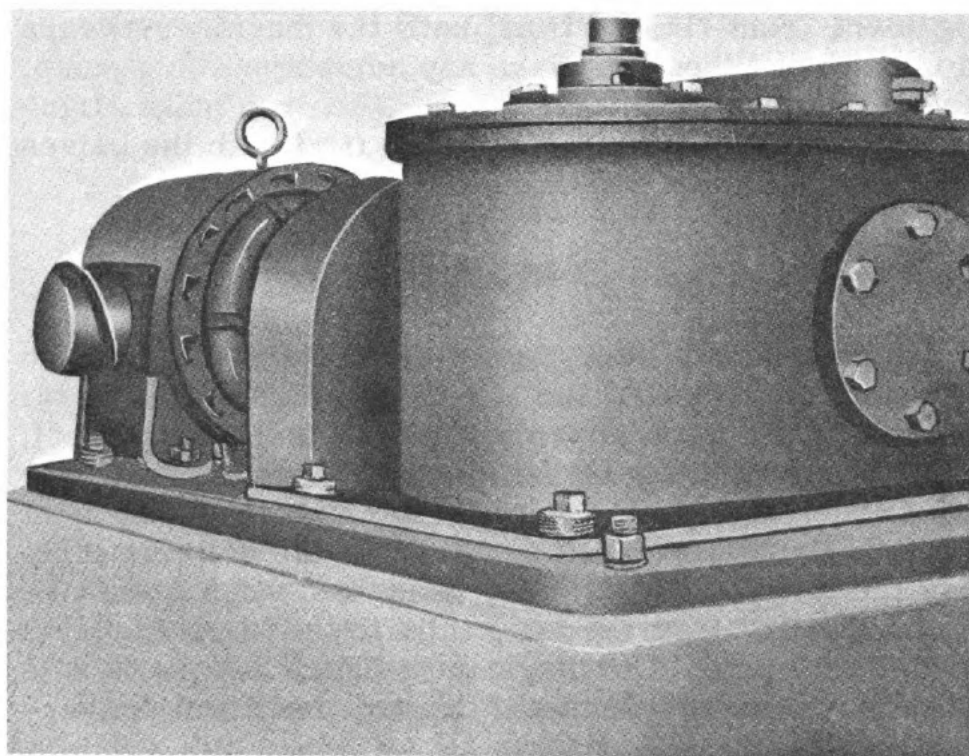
Baseplate of a pump unit grouted to the foundation.
